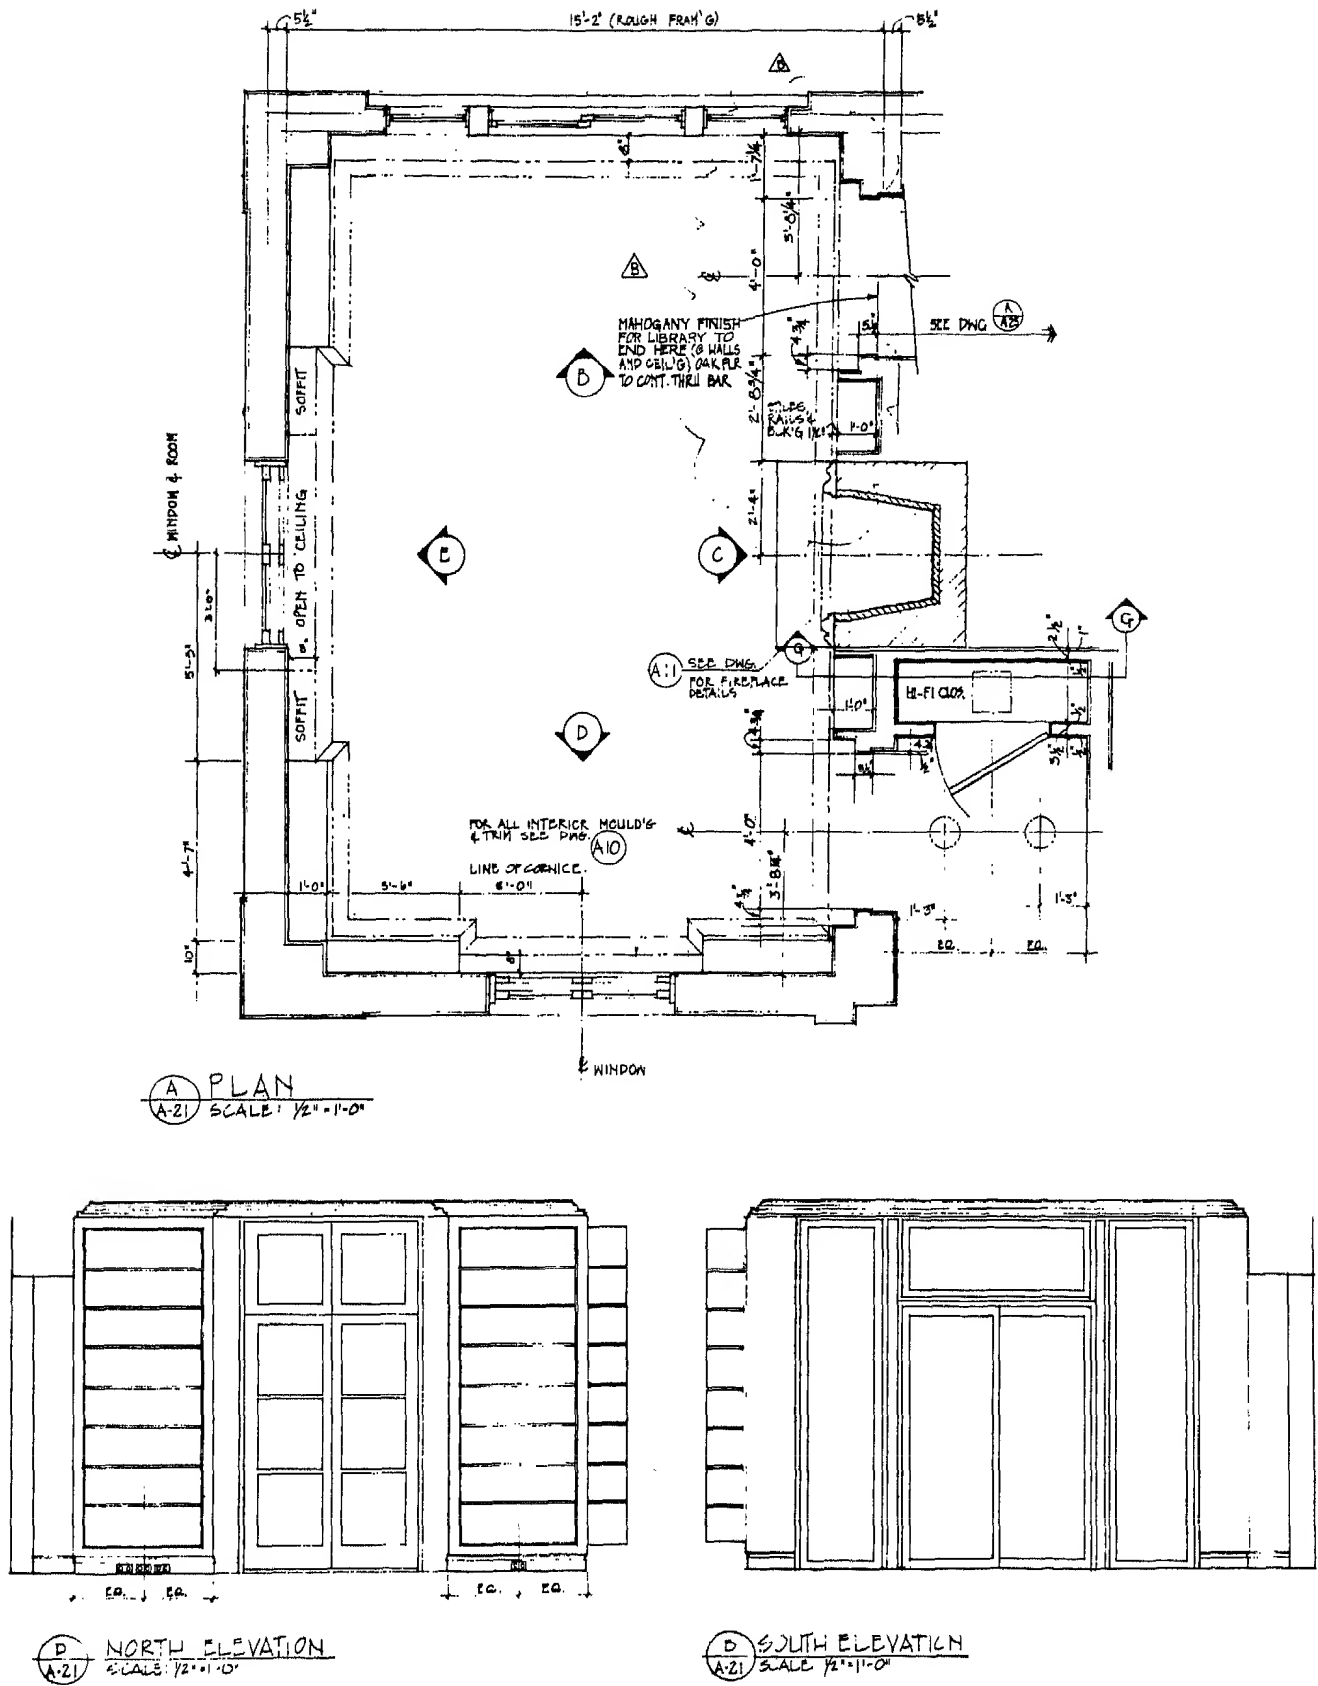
Working drawings of a library/living room, including a plan of the space, wall elevations, and some of the many details involved.
